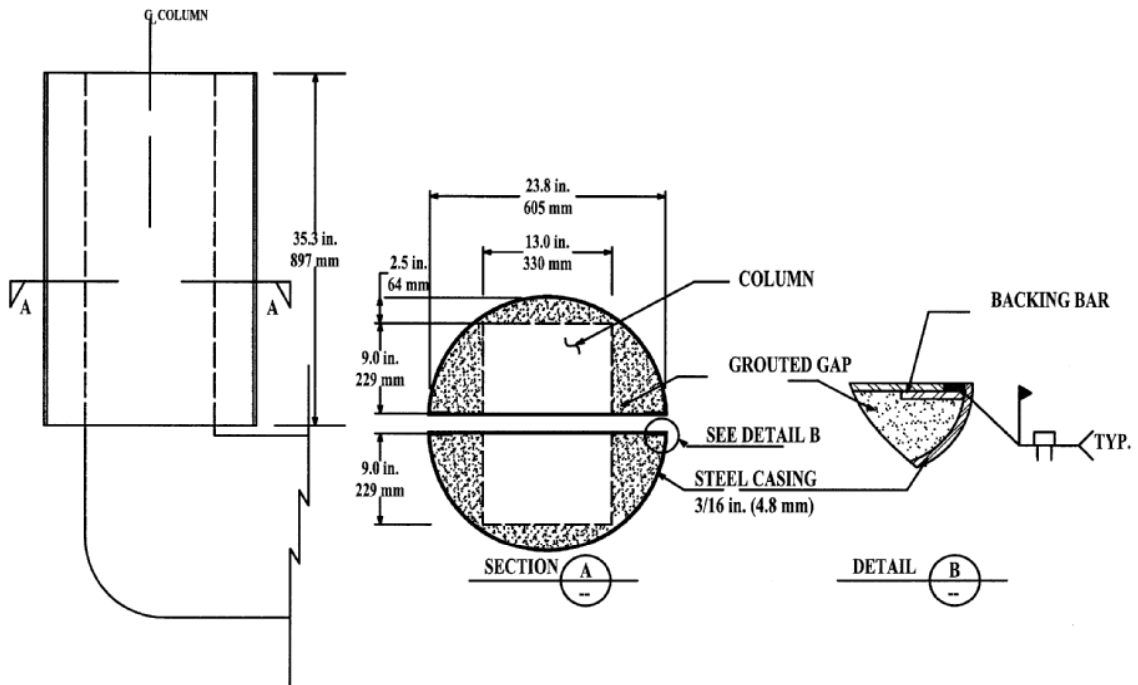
Retrofitted Split Long Outrigger Column Steel Jacket Retrofit Details
